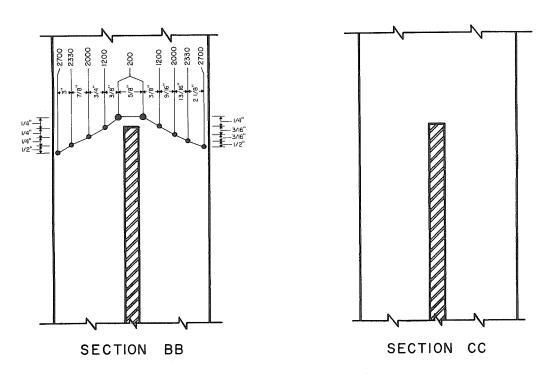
JOINT TYPE 3 - SPECIMEN No. I (TAPERED GUSSET PLATE)
